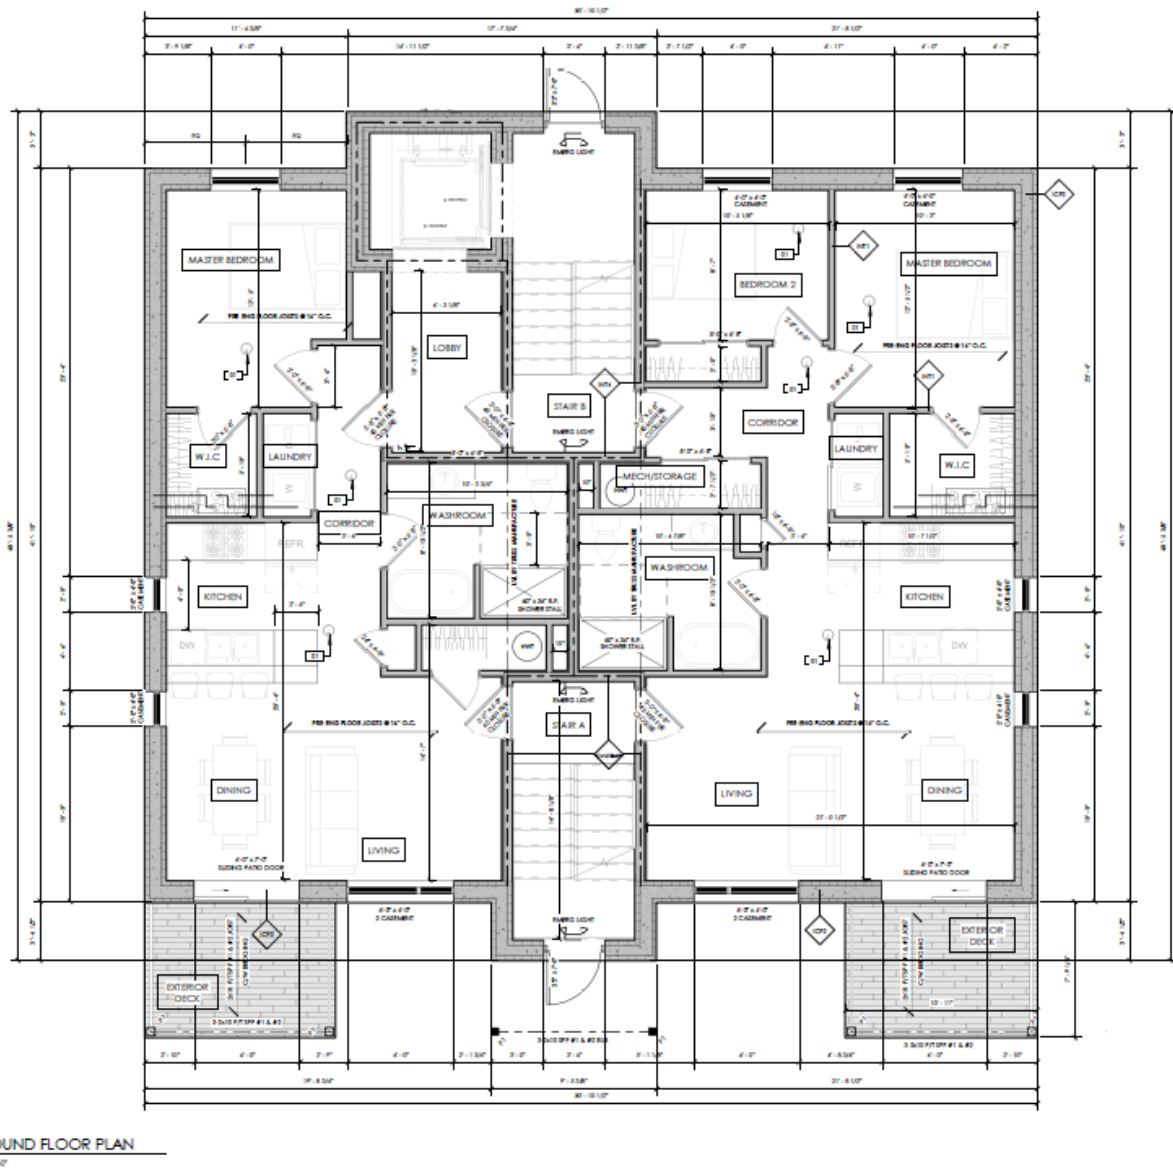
Conceptual floor plan, prepared by Wilson Architectural Design
